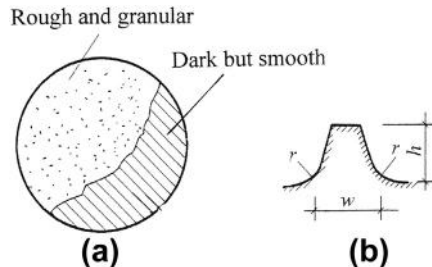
Fracture surface of reinforcement after being fatigued: (a) fracture surface, (b) shape of rib on outer surface
